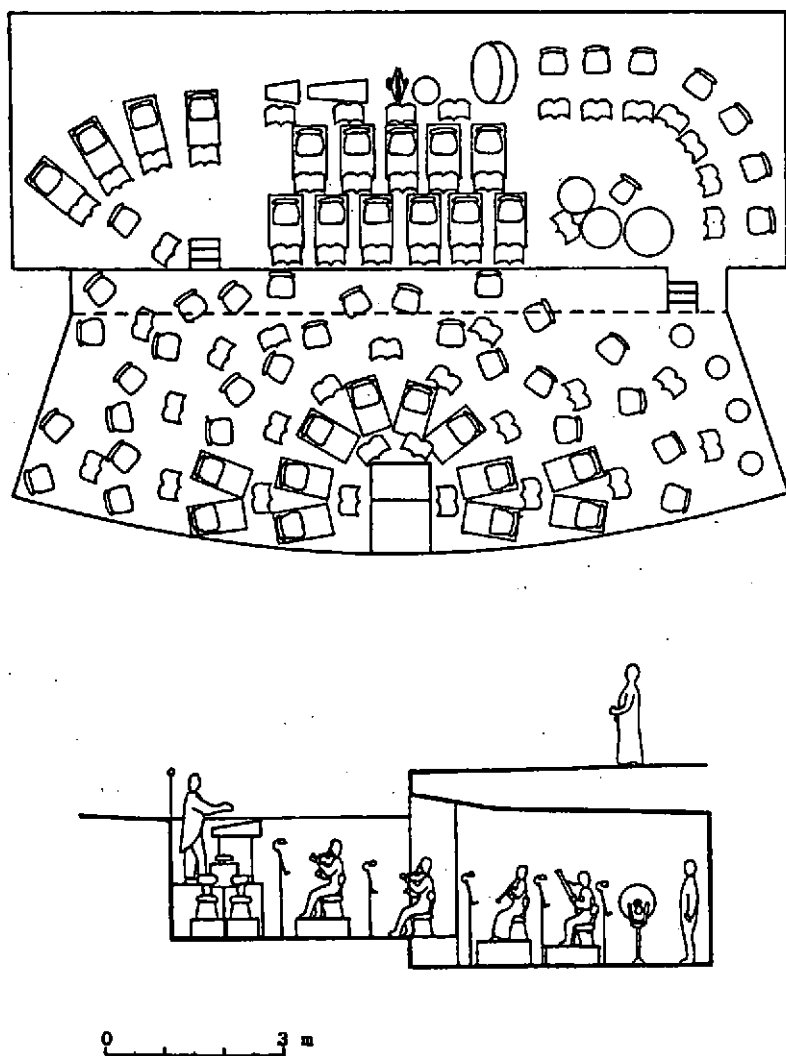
Plan and section of a typical heavily covered orchestra pit.
